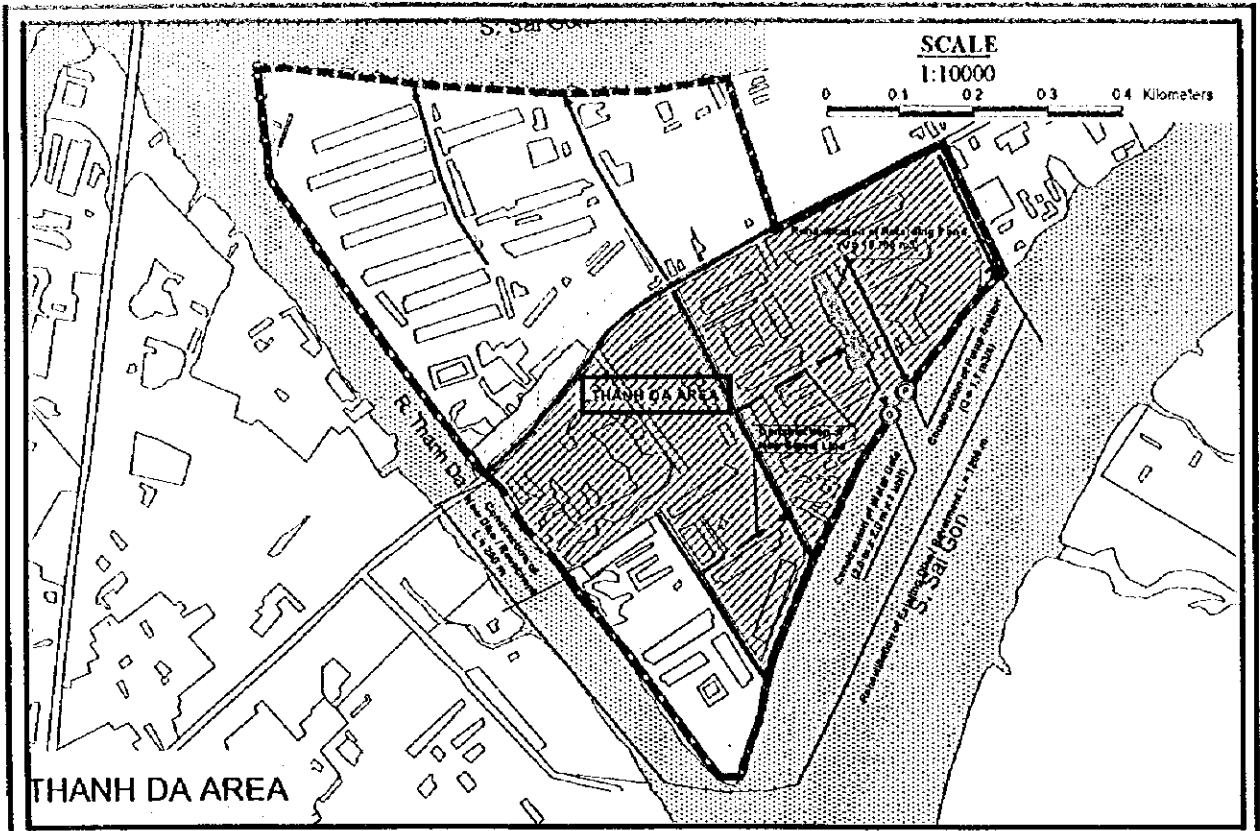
PROPOSED PUMP DRAINAGE PLAN
